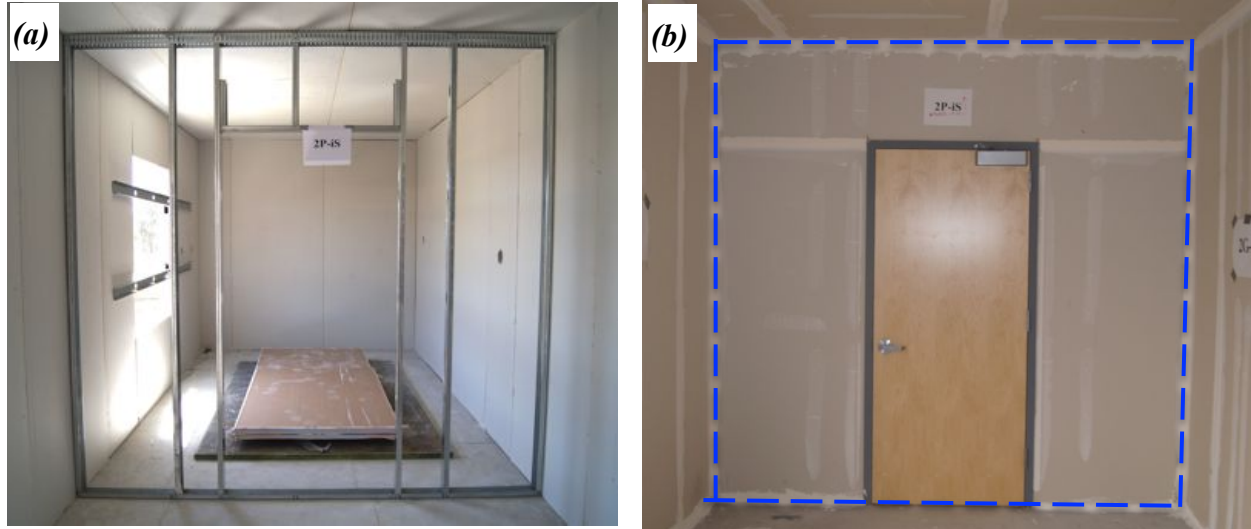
Interior partition wall: (a) CFS framing, and (b) finished wall.
